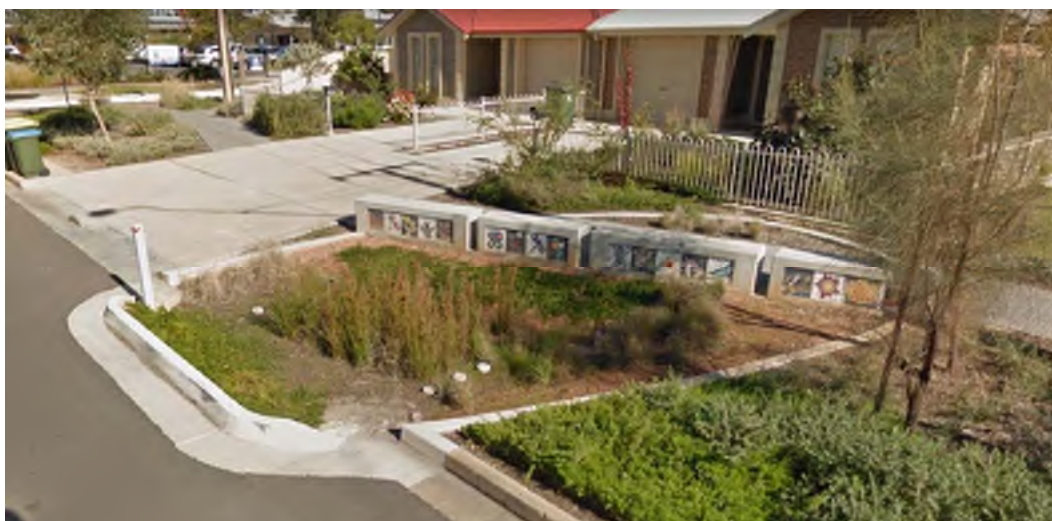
Bioretention System (Raingarden), Murchison Street, Woodville Gardens
